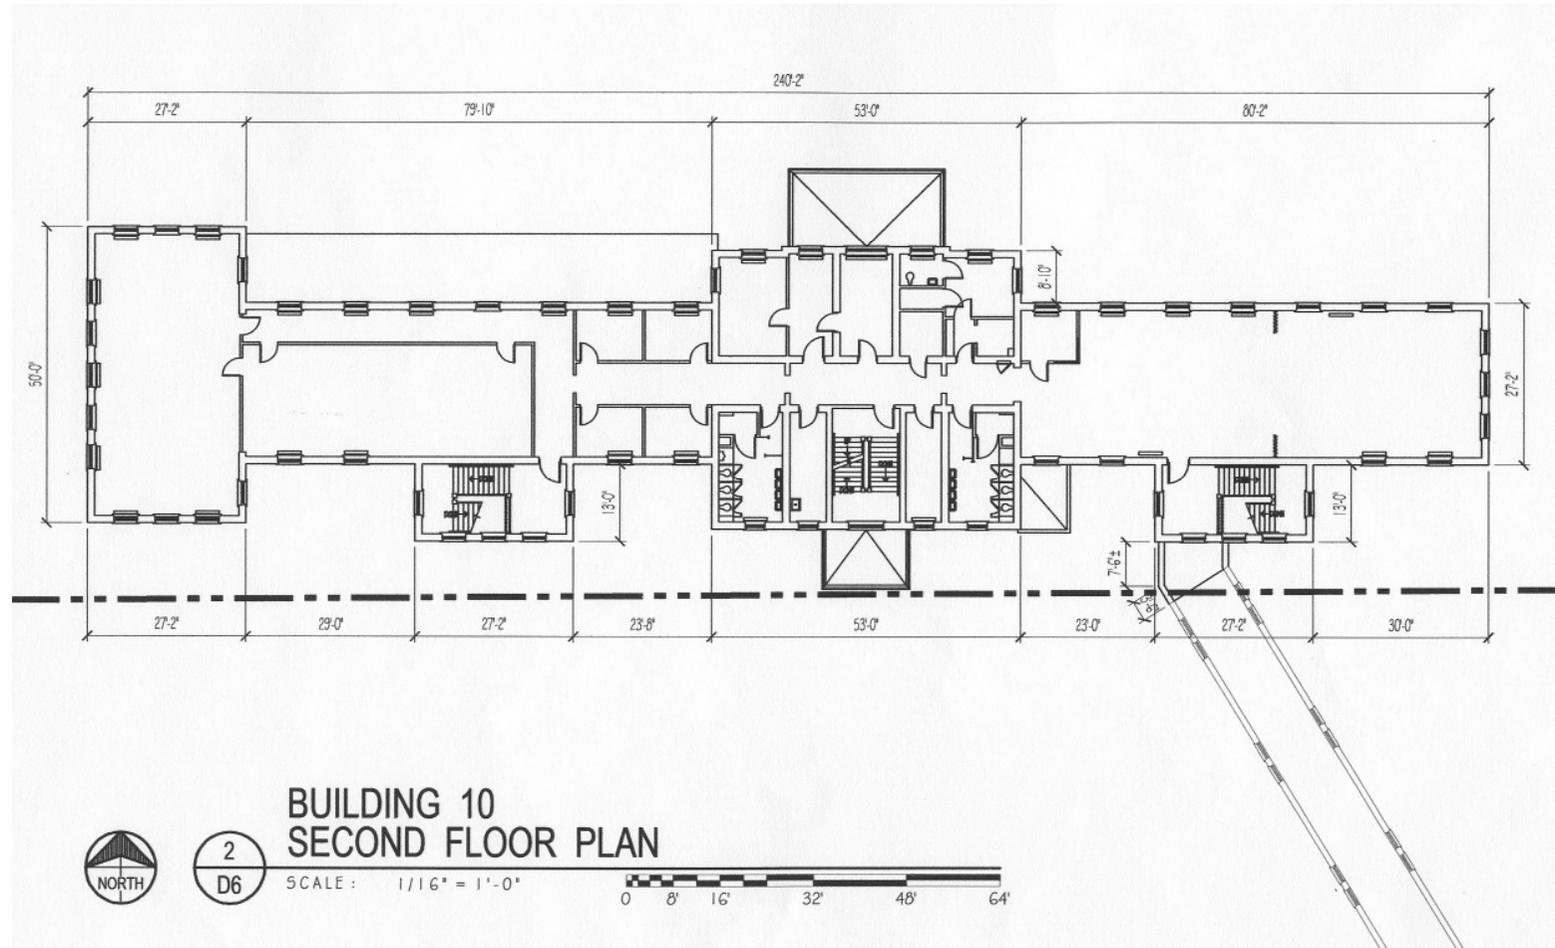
Second floor plan of Building 10, showing existing conditions (Walton and Associates 2003).
